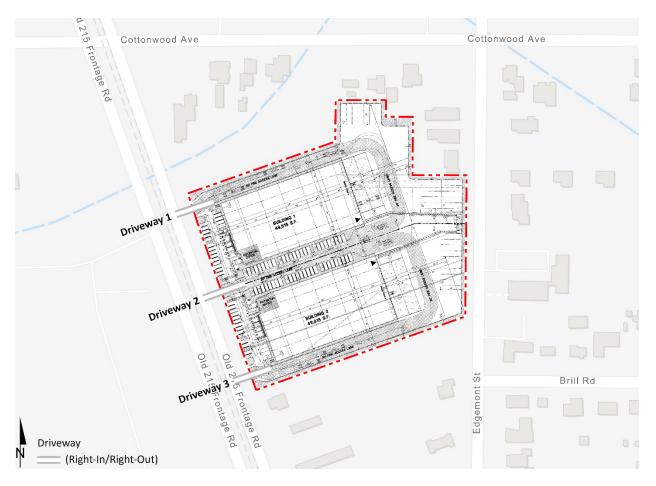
PRELIMINARY SITE PLAN
